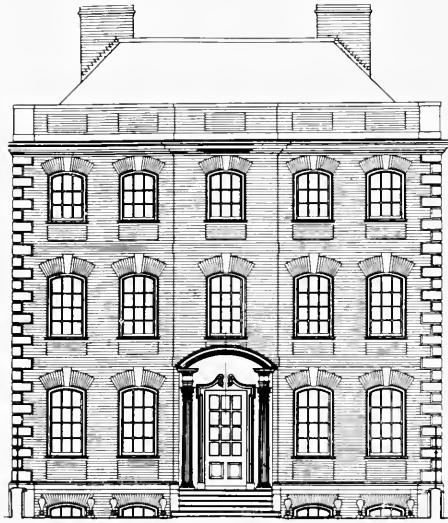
Rainham Hall, Essex, front elevation, from Tunstan Small and Christopher Woodbridge, Houses of the Wren and Early Georgian Periods (New York: William Helbur, Inc., 1928). Photograph by Hans Lorenz. The layout and level of architectural embellishment of this small, by English standards, house built in the 1720s are similar to Rosewell.
